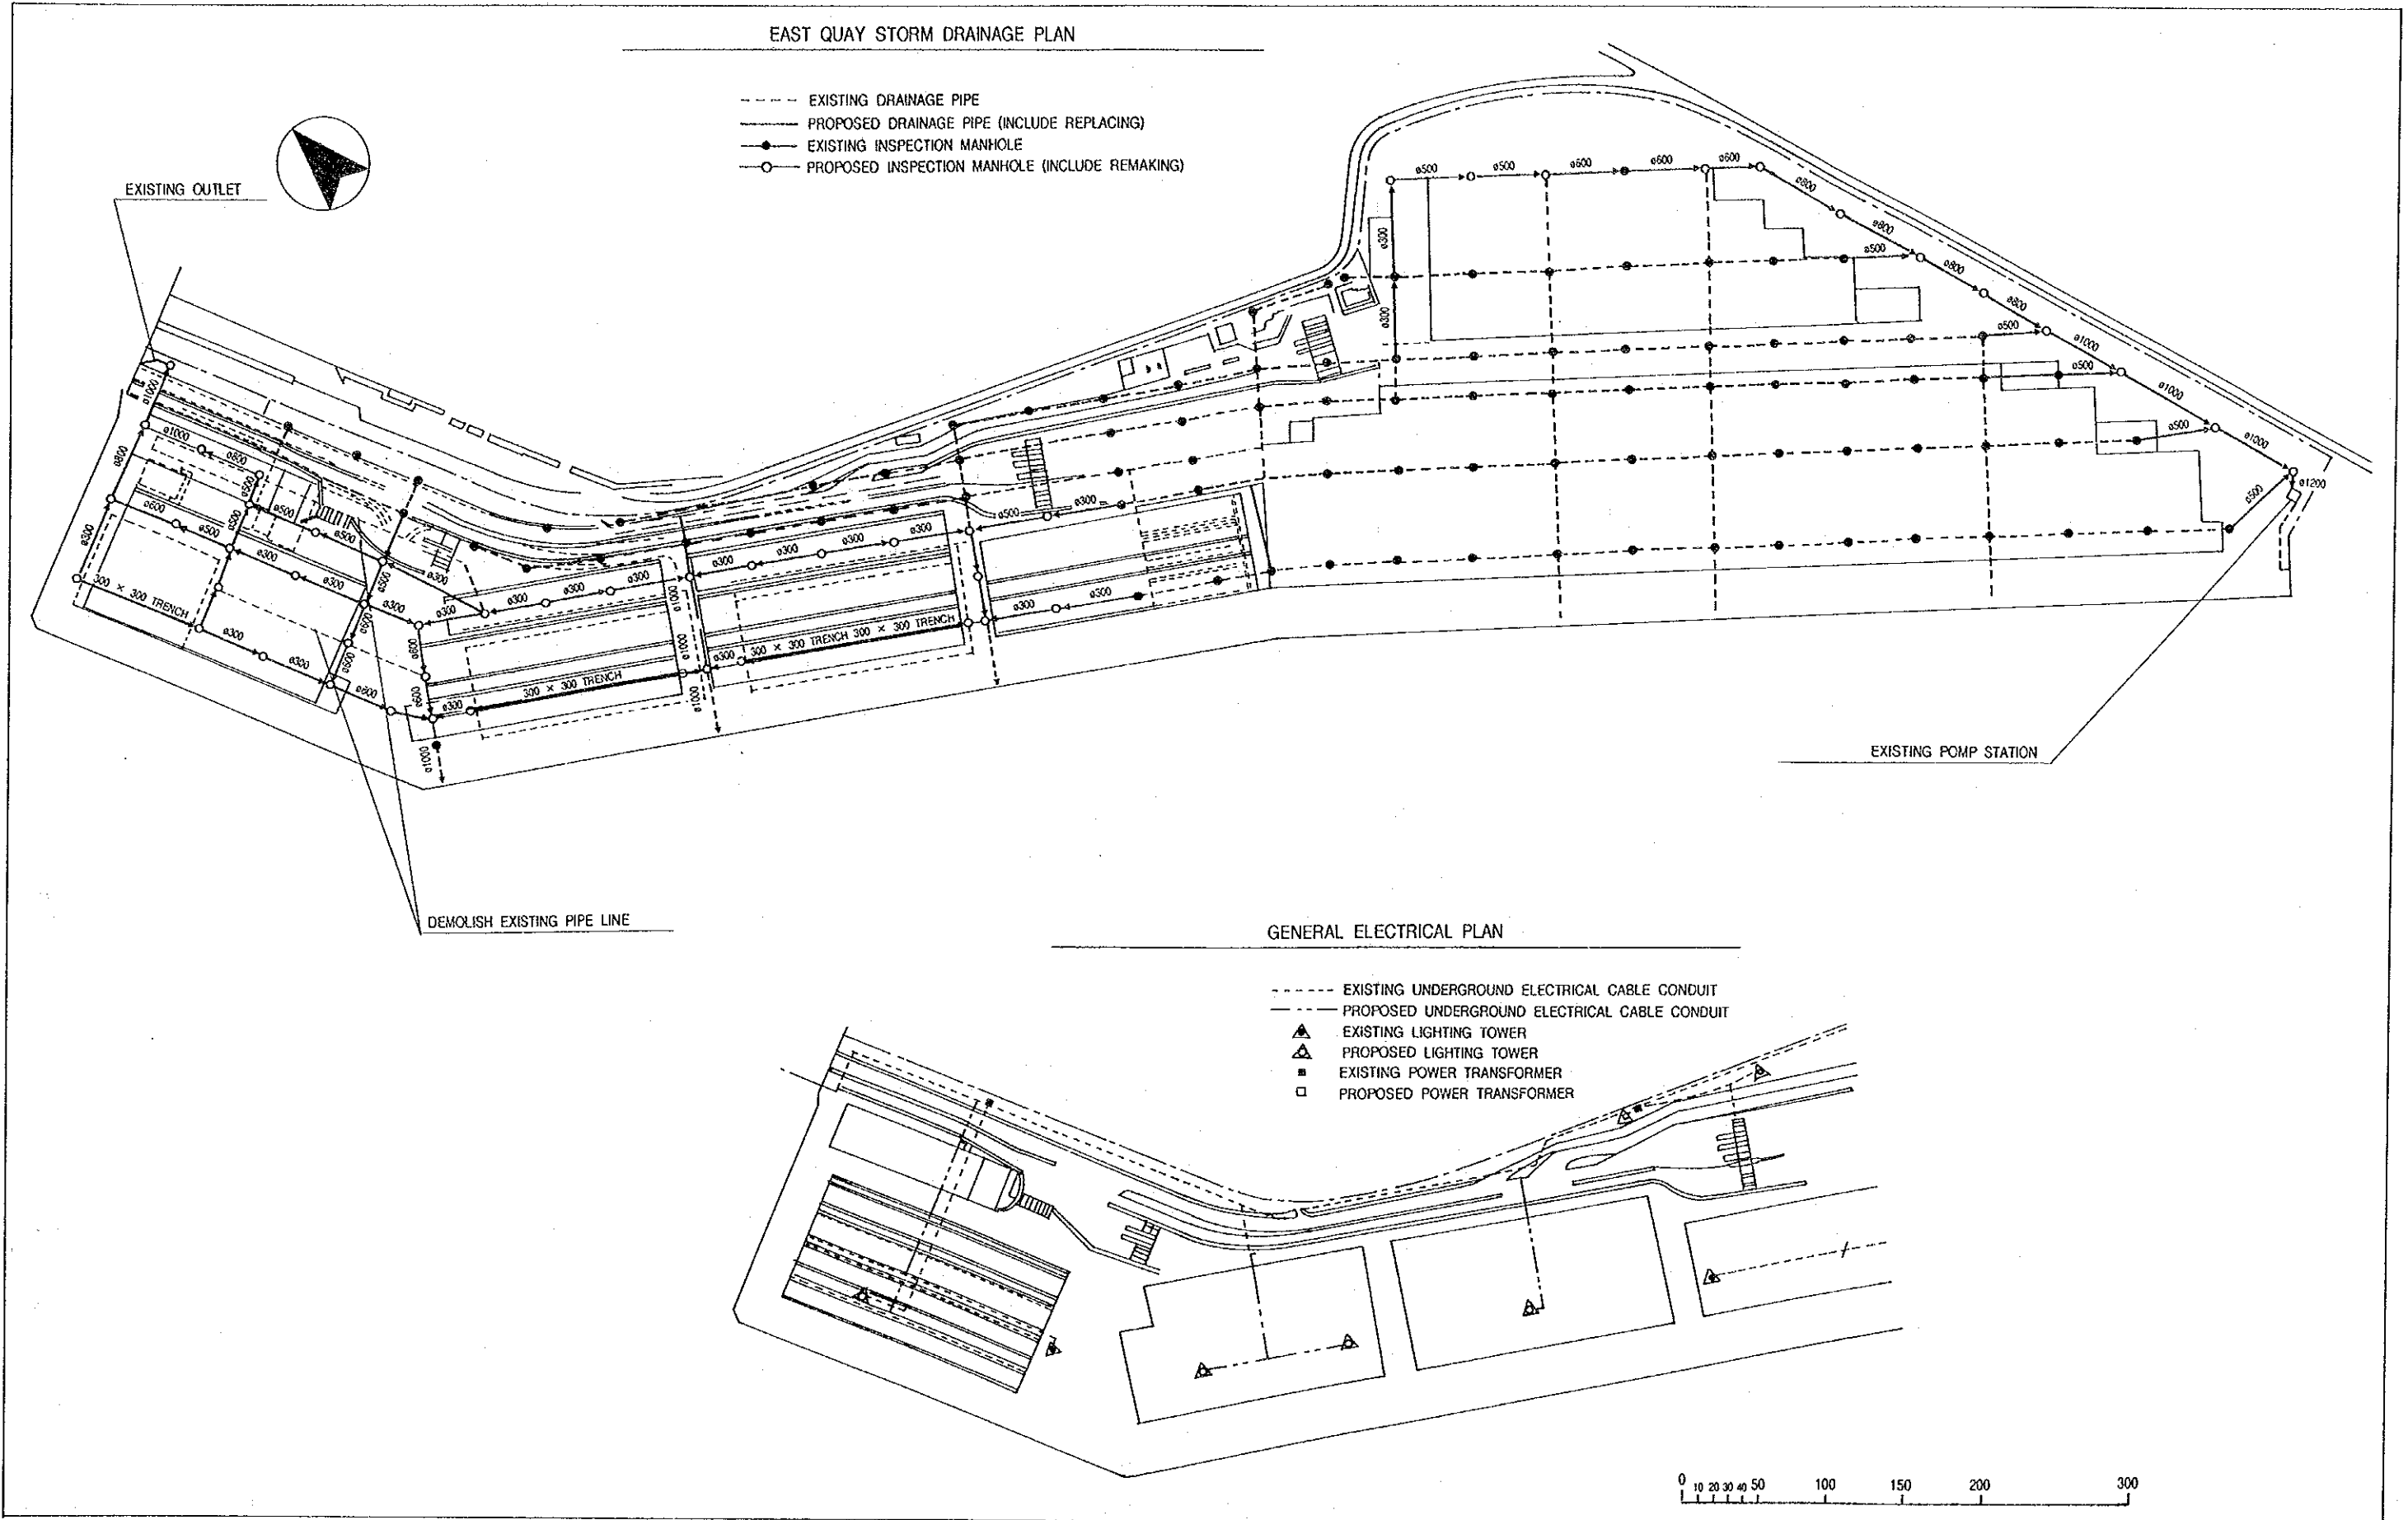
East Quay Drainage Plan & Electrical Plan
